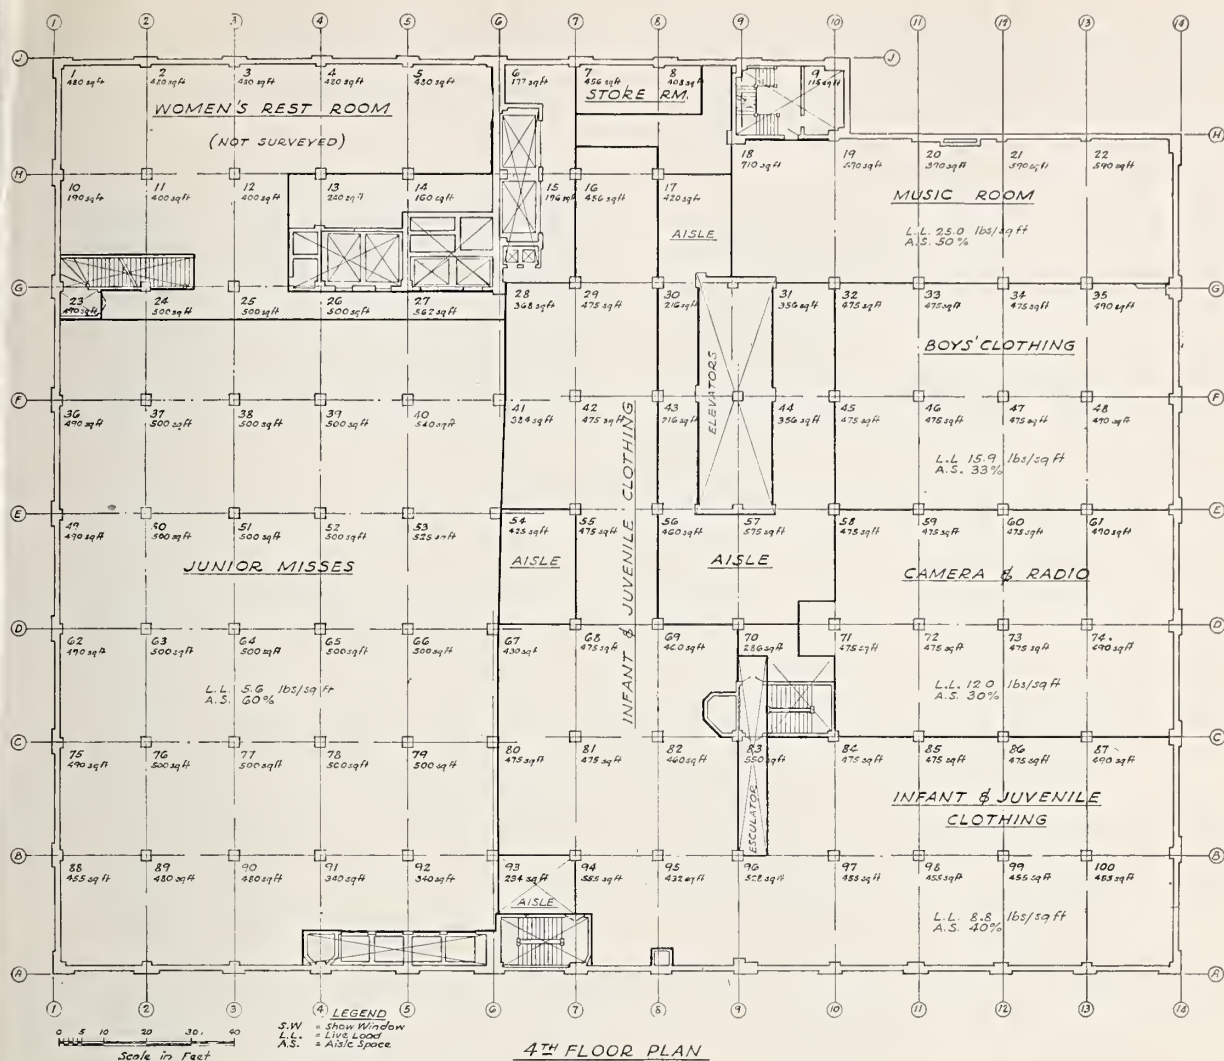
Fourth-floor plan, department store, Washington, D. C.
